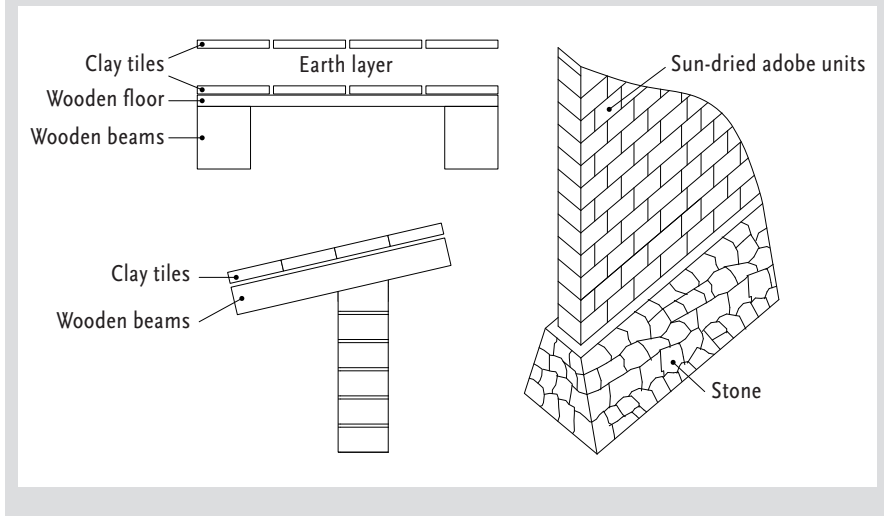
Details of floor tile 'terrado', roof tile (add tiles) and foundation and walls of a Mexican traditional reference dwelling
